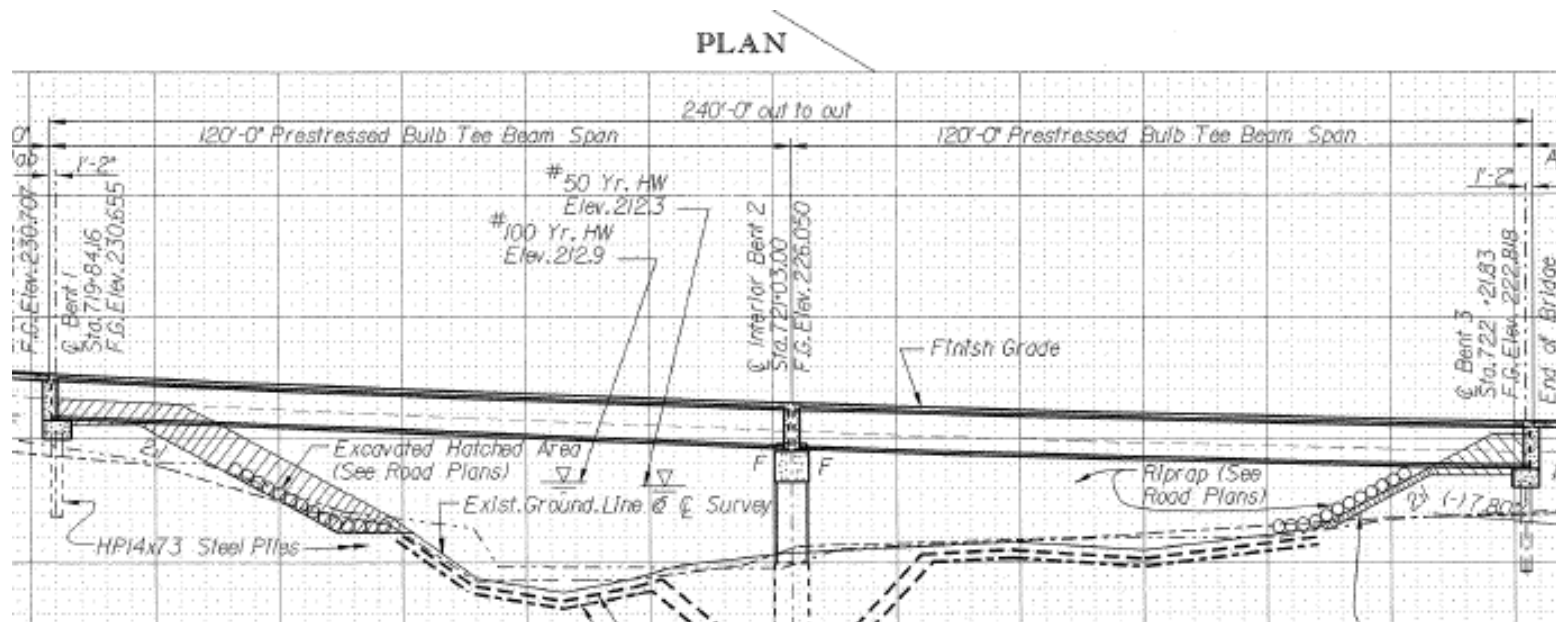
Elevation View of Archetype 4 Bridge Drawing
